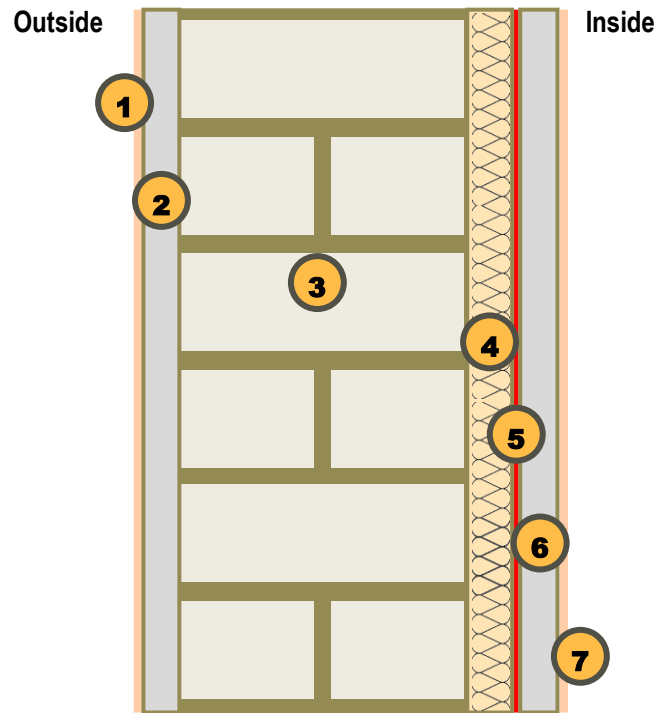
Construction detail for wall assembly: Fly-ash block with internal insulation
